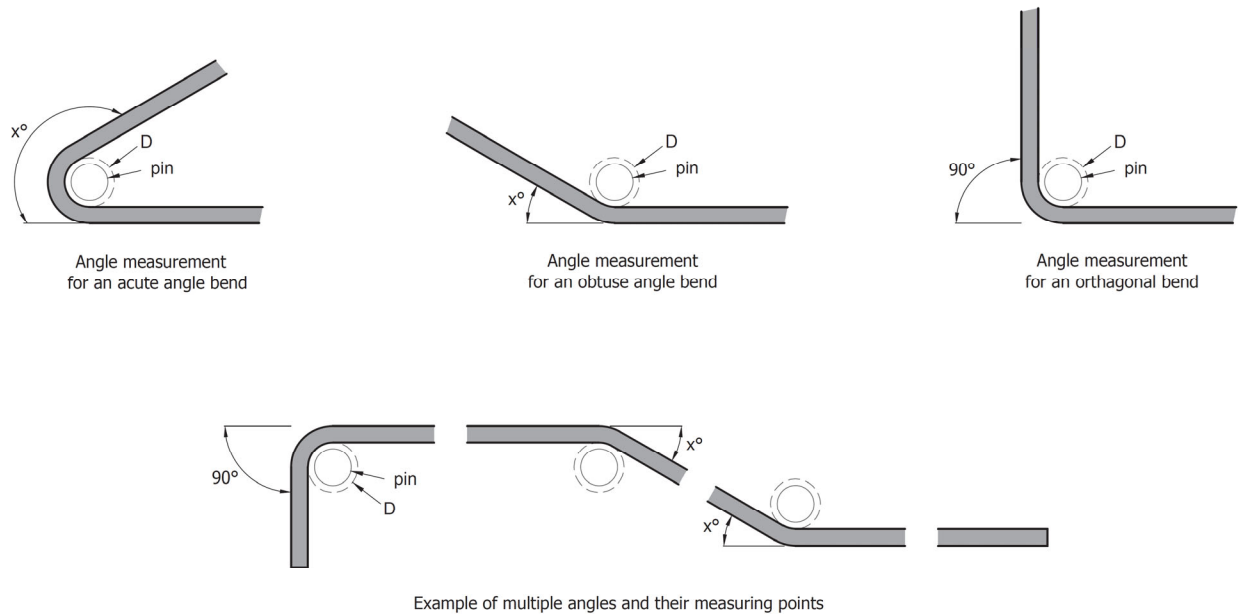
Measuring points for fabrication and inspection of reinforcing bars
